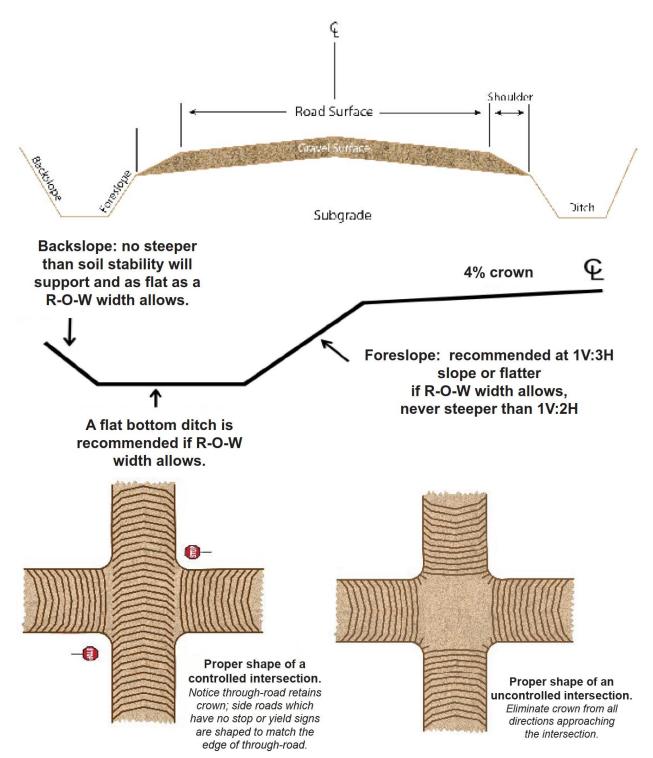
Unpaved Roadway Proper Shape Guidance (Gravel Roads Construction & Maintenance Guide, FHWA, 2015)
